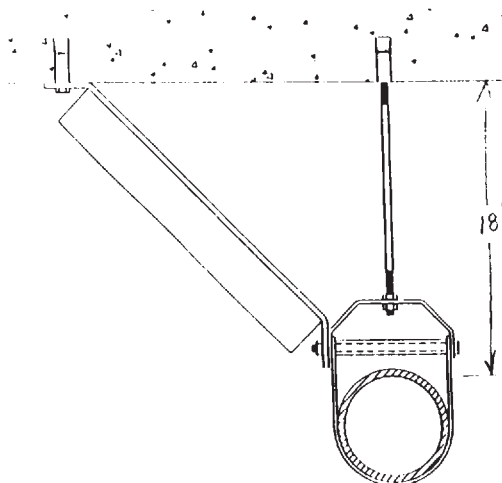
HORIZONTAL PIPE WITH SWAY BRACE
